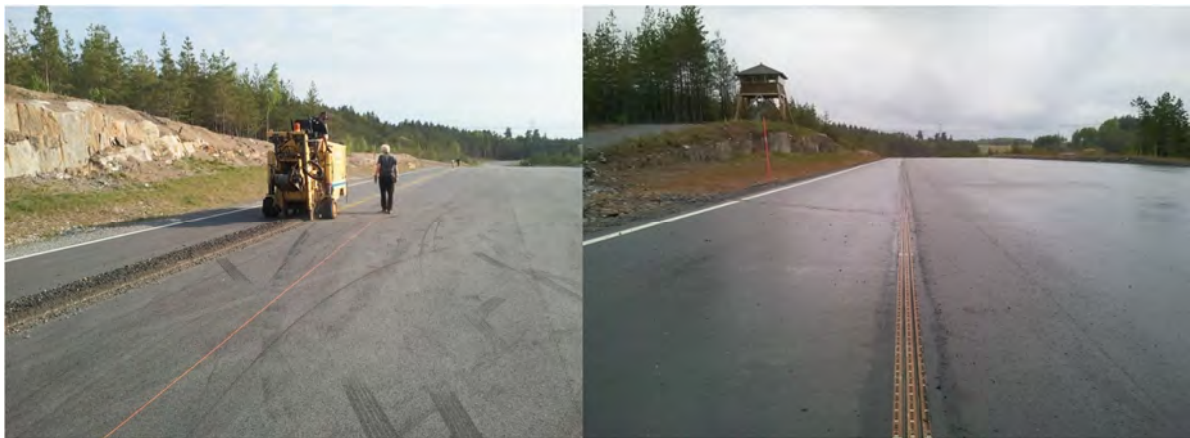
a) excavation of existing asphalt surface, b) completed electrified road
